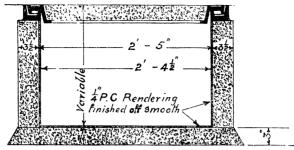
CHANNEL JOINT BOX, CONCRETE. (J.R.F. 2.)
